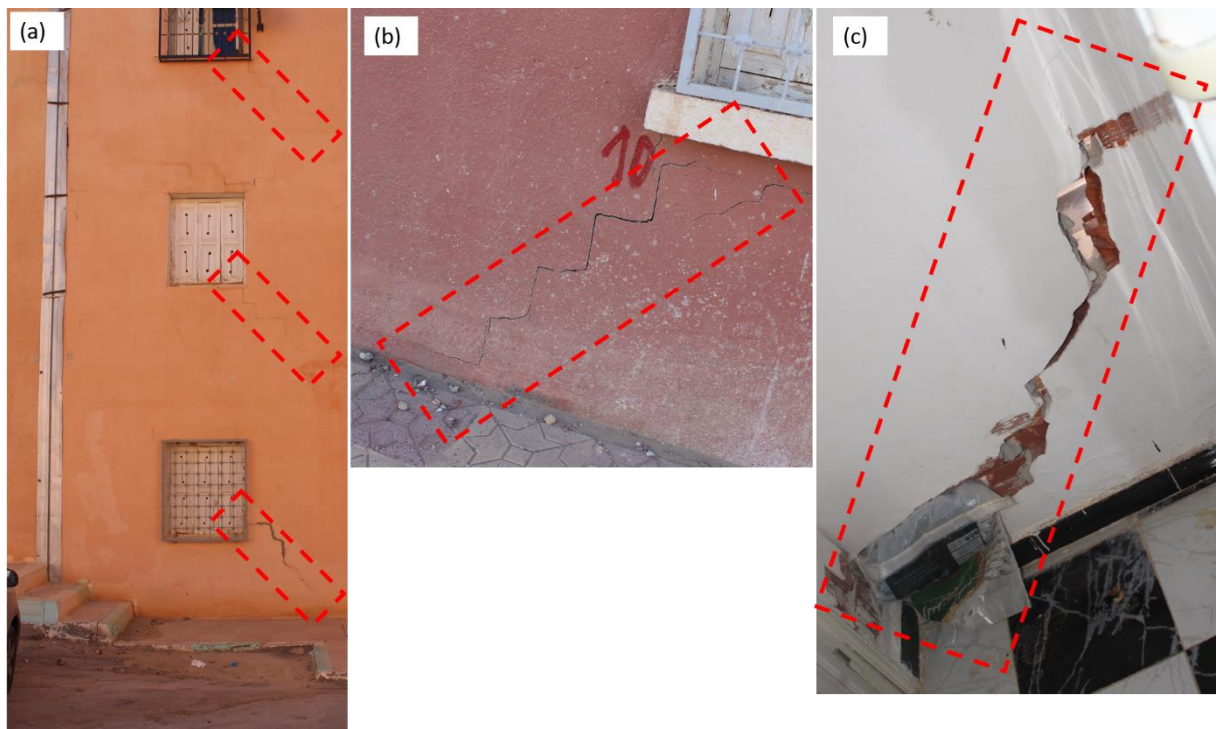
Diagonal masonry wall cracking recorded on: (a) Building 5 of Area 1; (b) Building 8 of Area 1, (c) Interior of the building 4 of Area 3.
